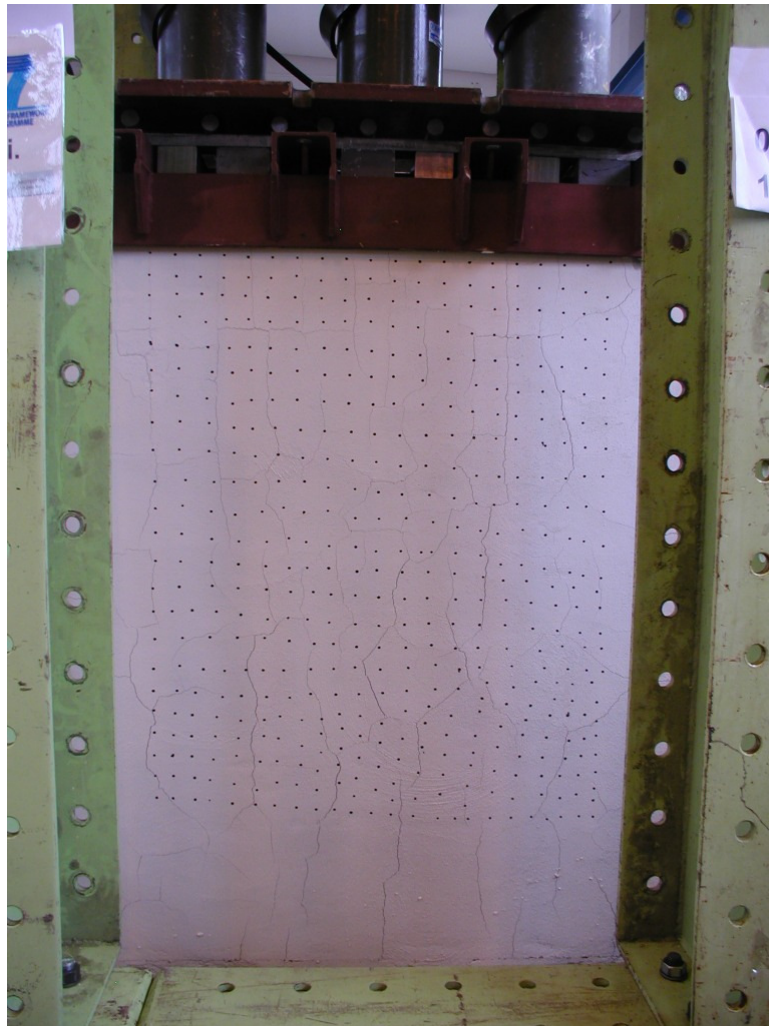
Crack pattern at failure of the adobe wall strengthened with reinforced mortar layers under a combination of vertical compression and cyclic shear.
